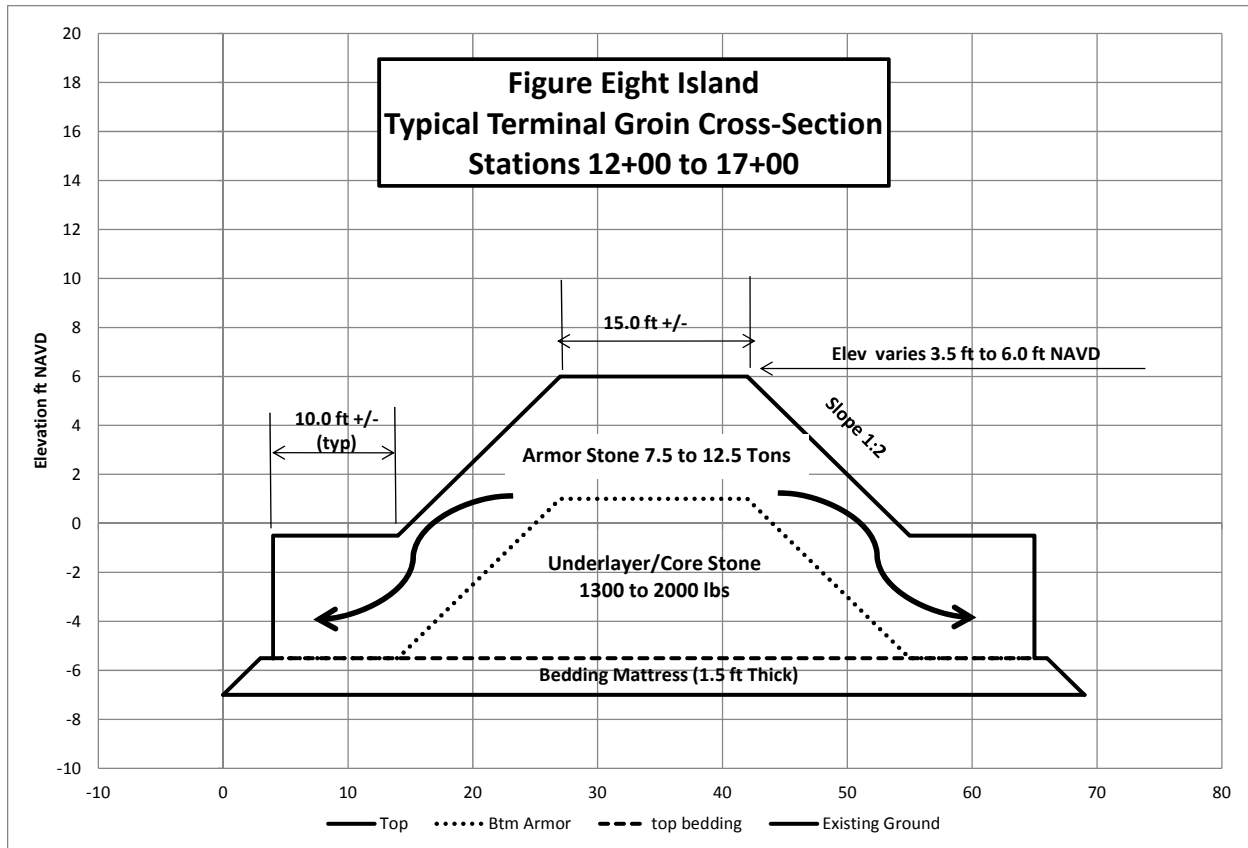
Typical Terminal Groin Cross-Section 2.
